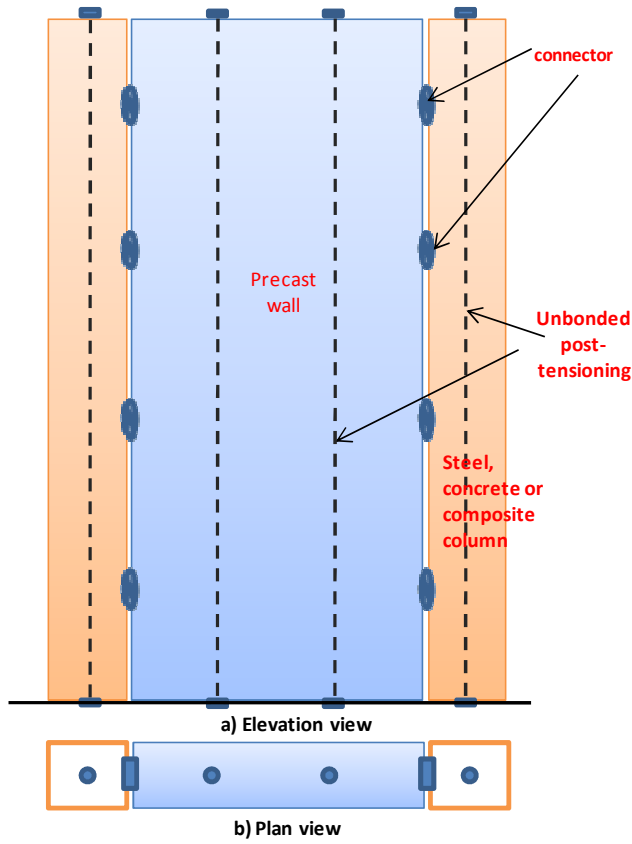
Typical Details of a precast wall with end columns (PreWEC) system
